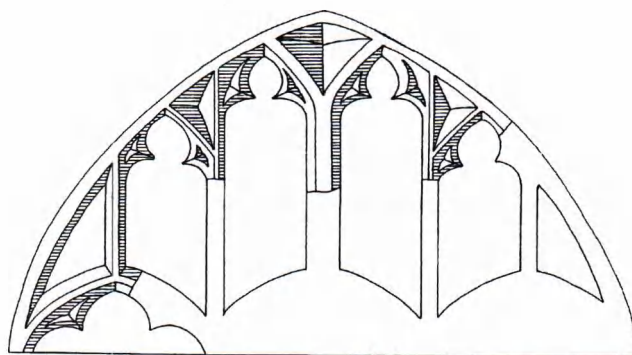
Detail of window tracery in the west elevation of Chew Cottage (James Russell, 1999)
